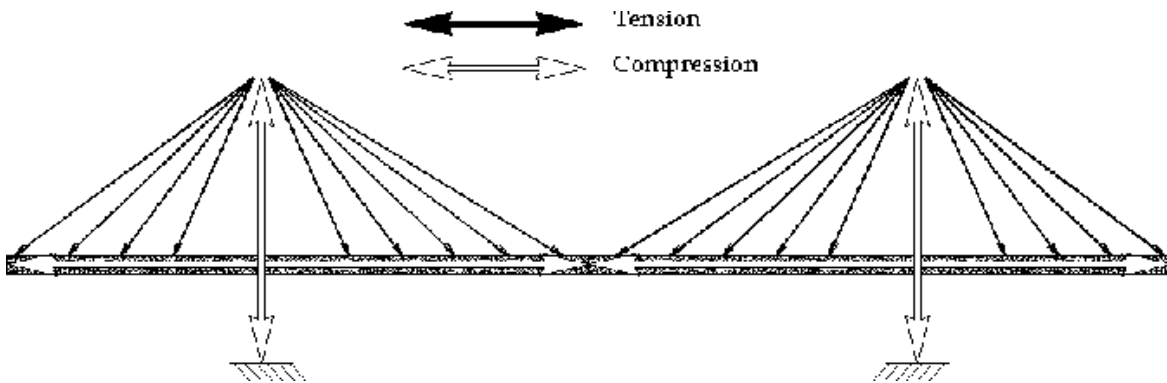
cable-stayed Bridge Fundamental concepts
